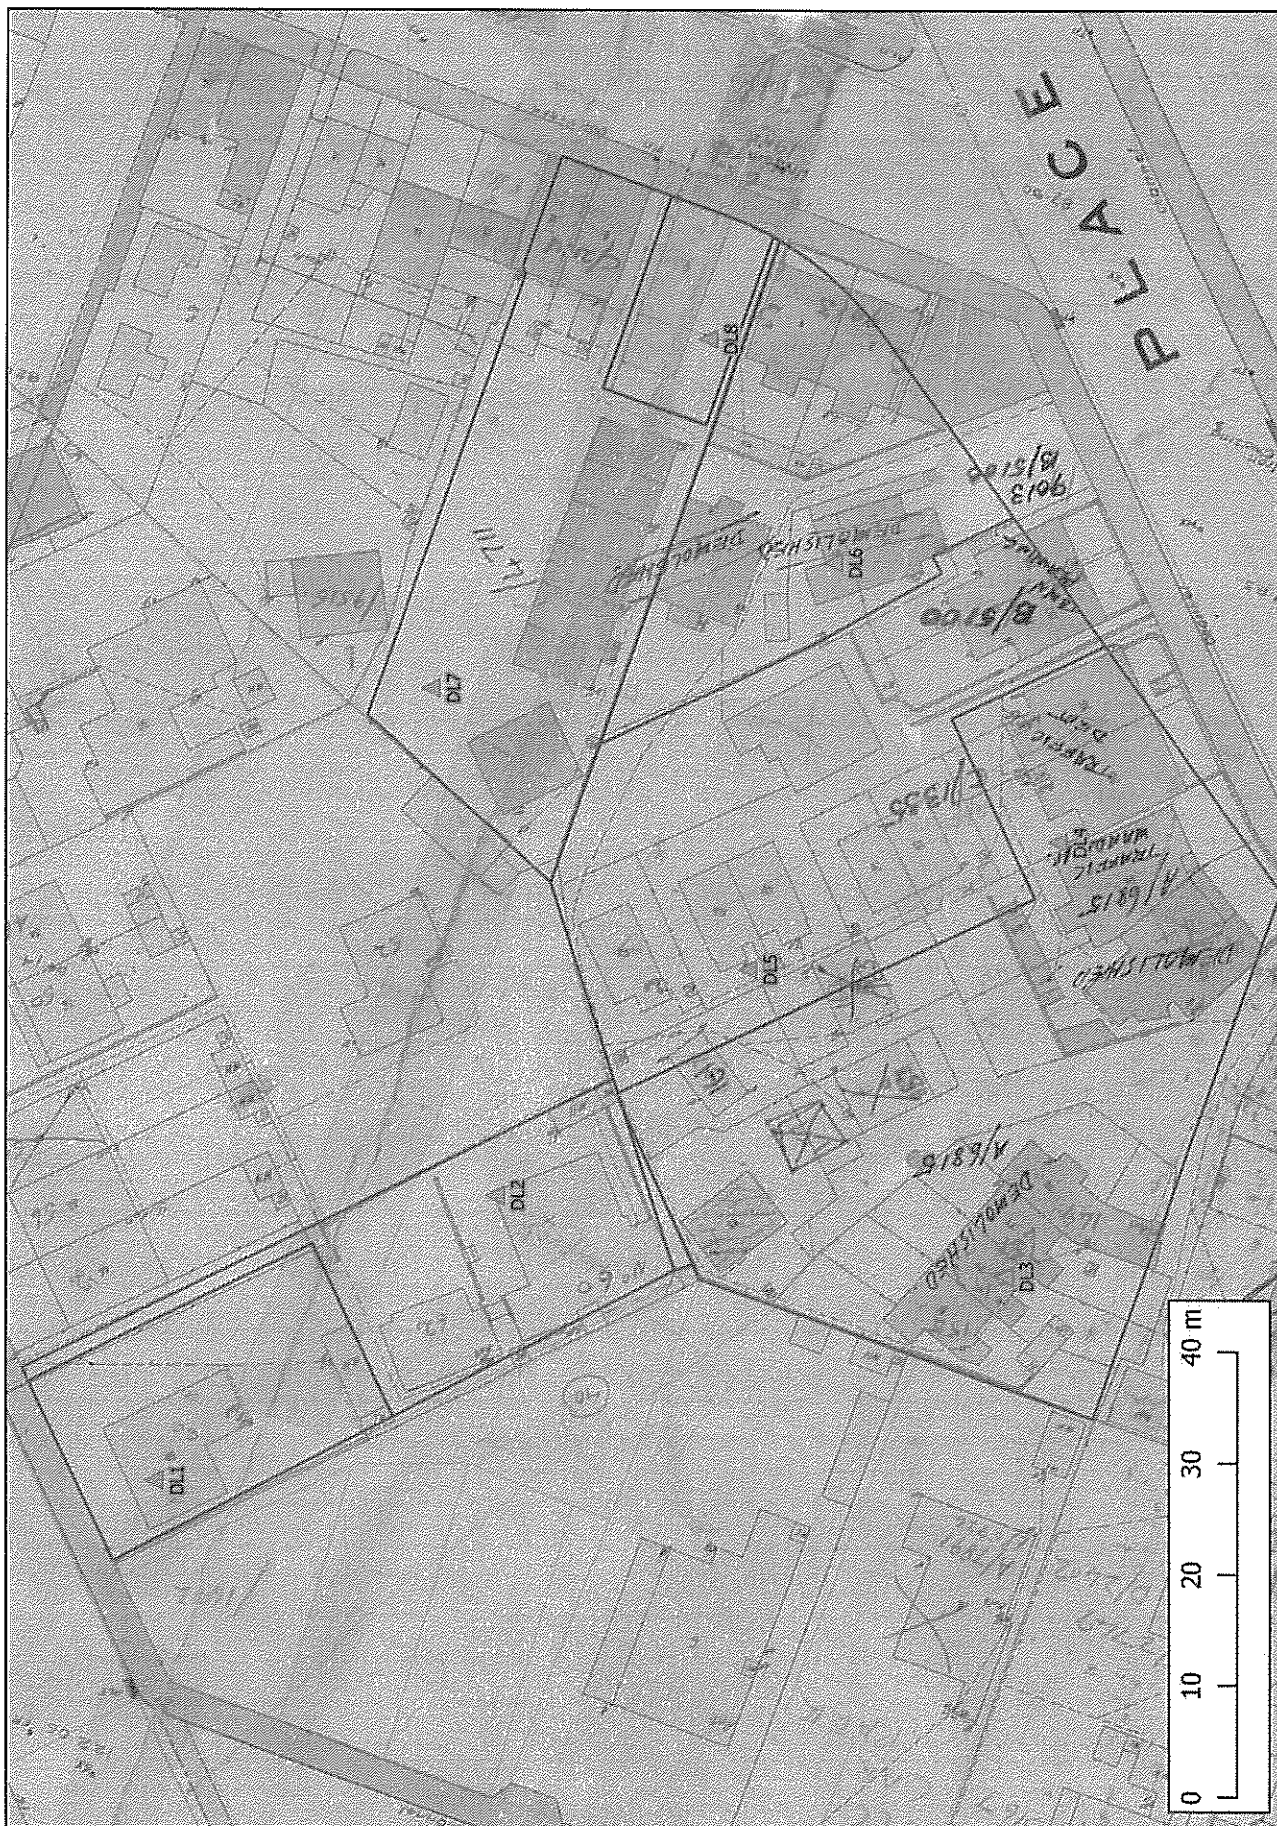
Dunedin Drainage and Sewerage Board plans sheet 32 overlaid with drill locations (blue triangles) and relevant modern property boundaries (red)
